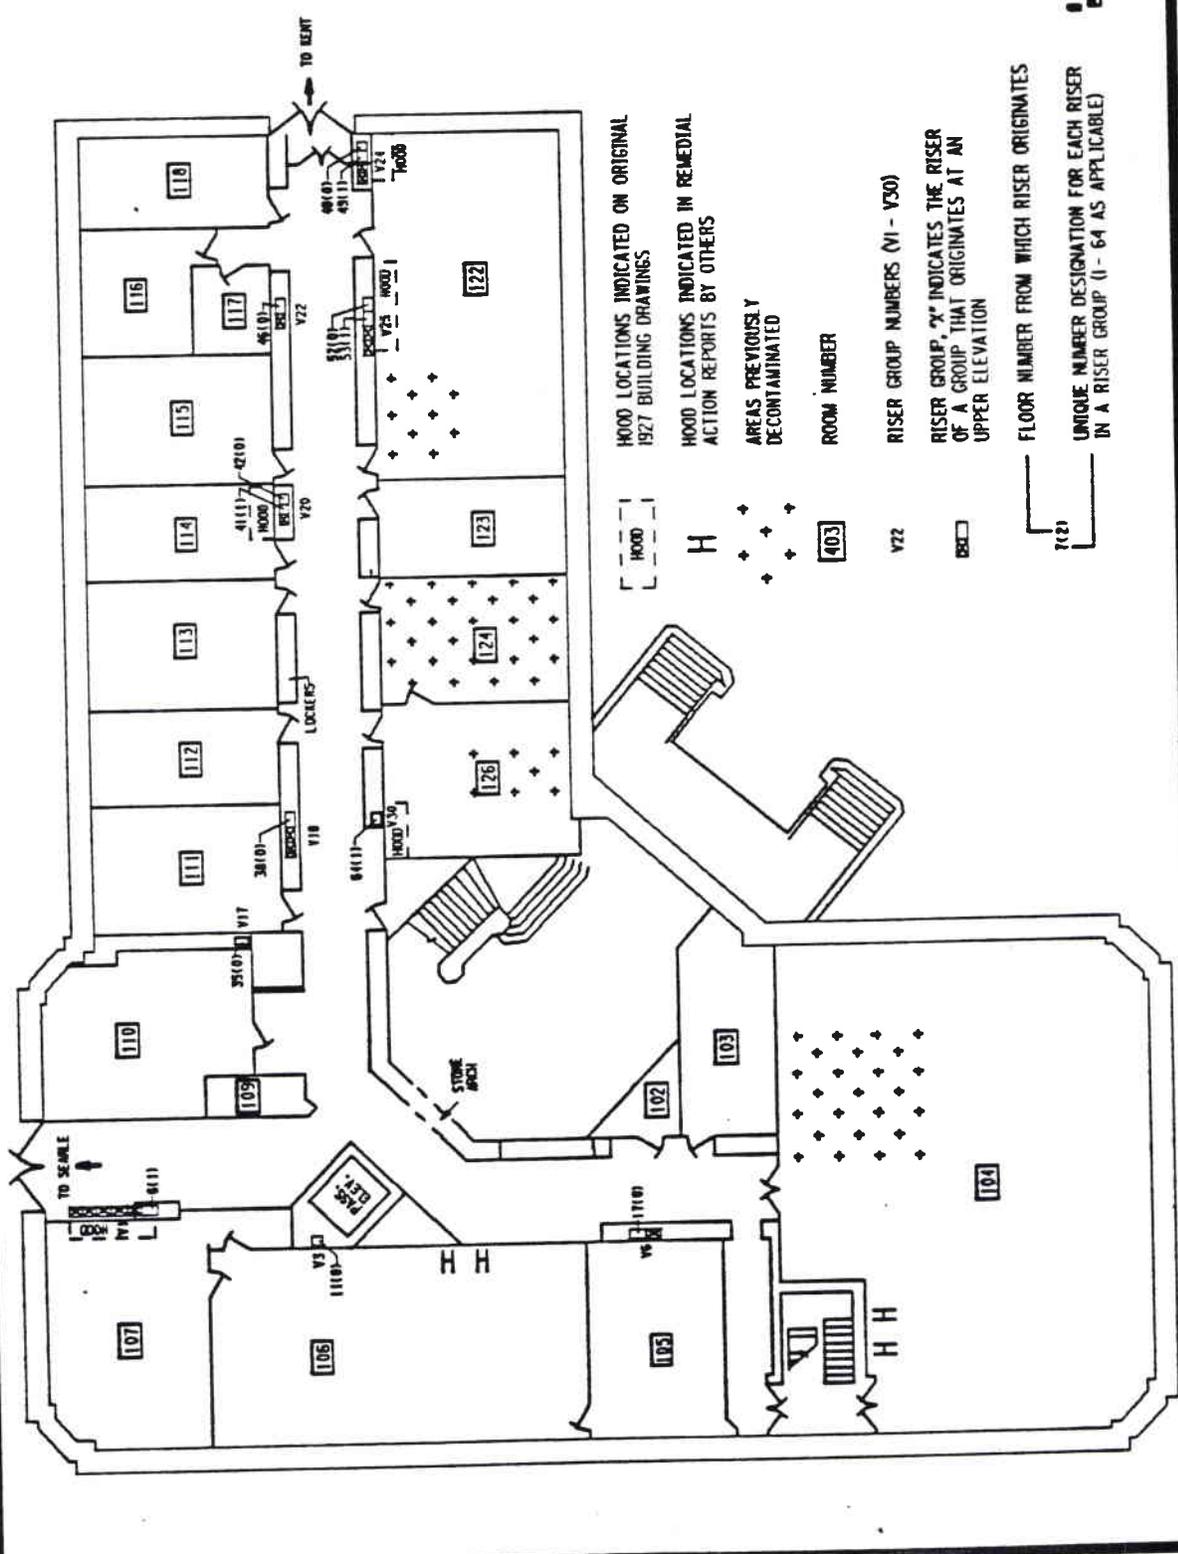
FLOOR PLAN OF THE BASEMENT
